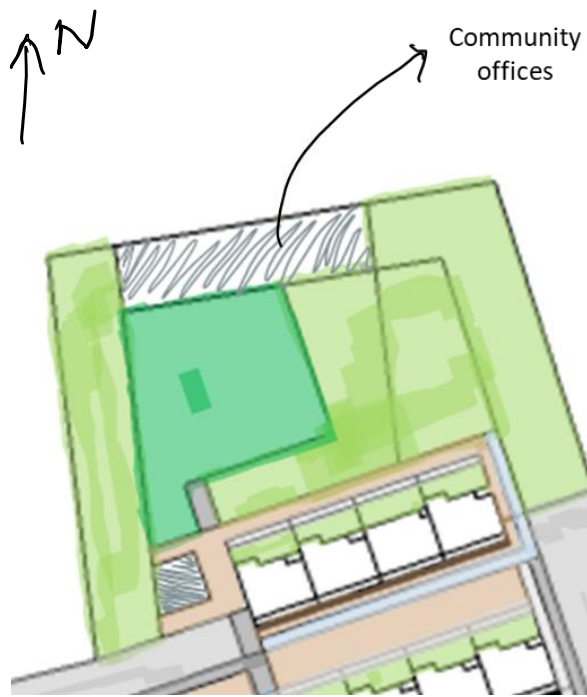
Close up site plan showing location of Community offices for additional roof top solar panels
